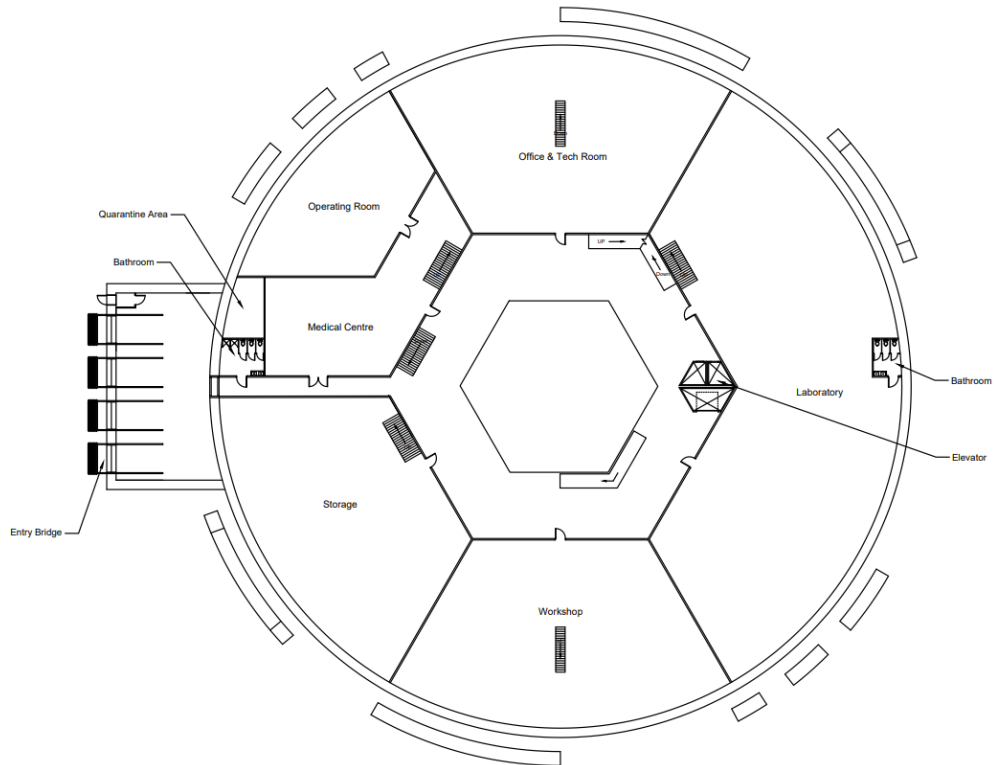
Floor plan of the L1 of the lunar base (above ground.)
